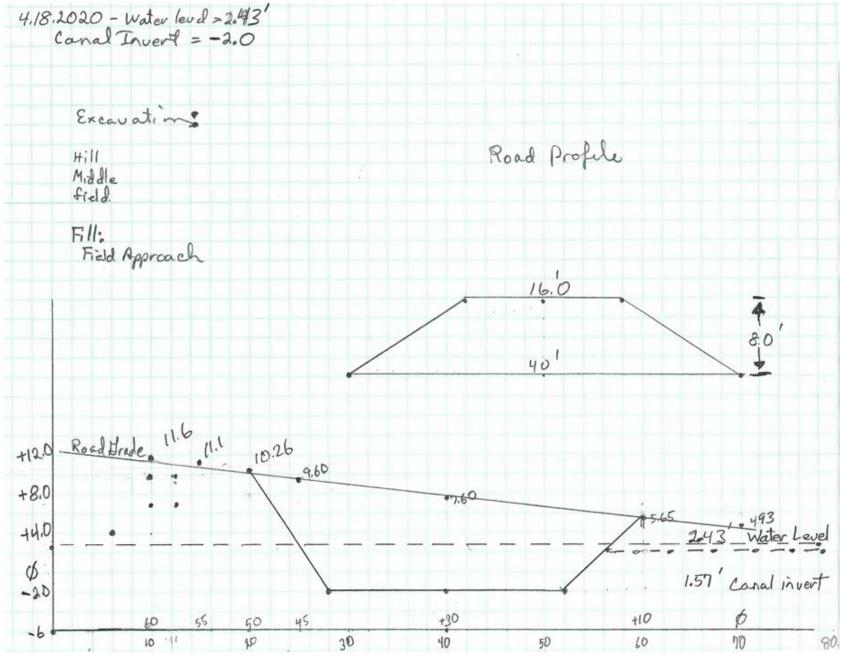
Unit 1 S. Canal S.E. pasture access bridge cross-section drawing profile of canal excavation and road profile.
